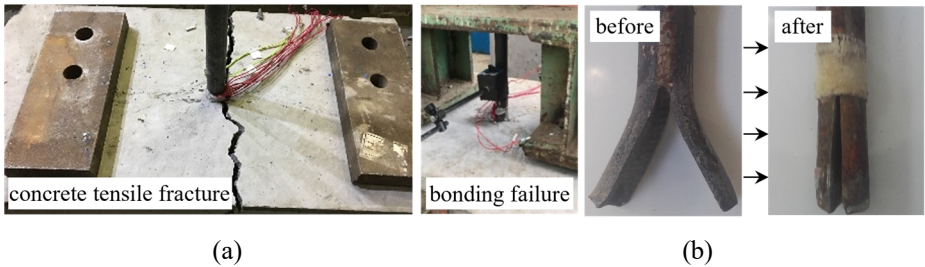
Typical failure modes: (a) anchorage concrete; (b) anchor bolt
